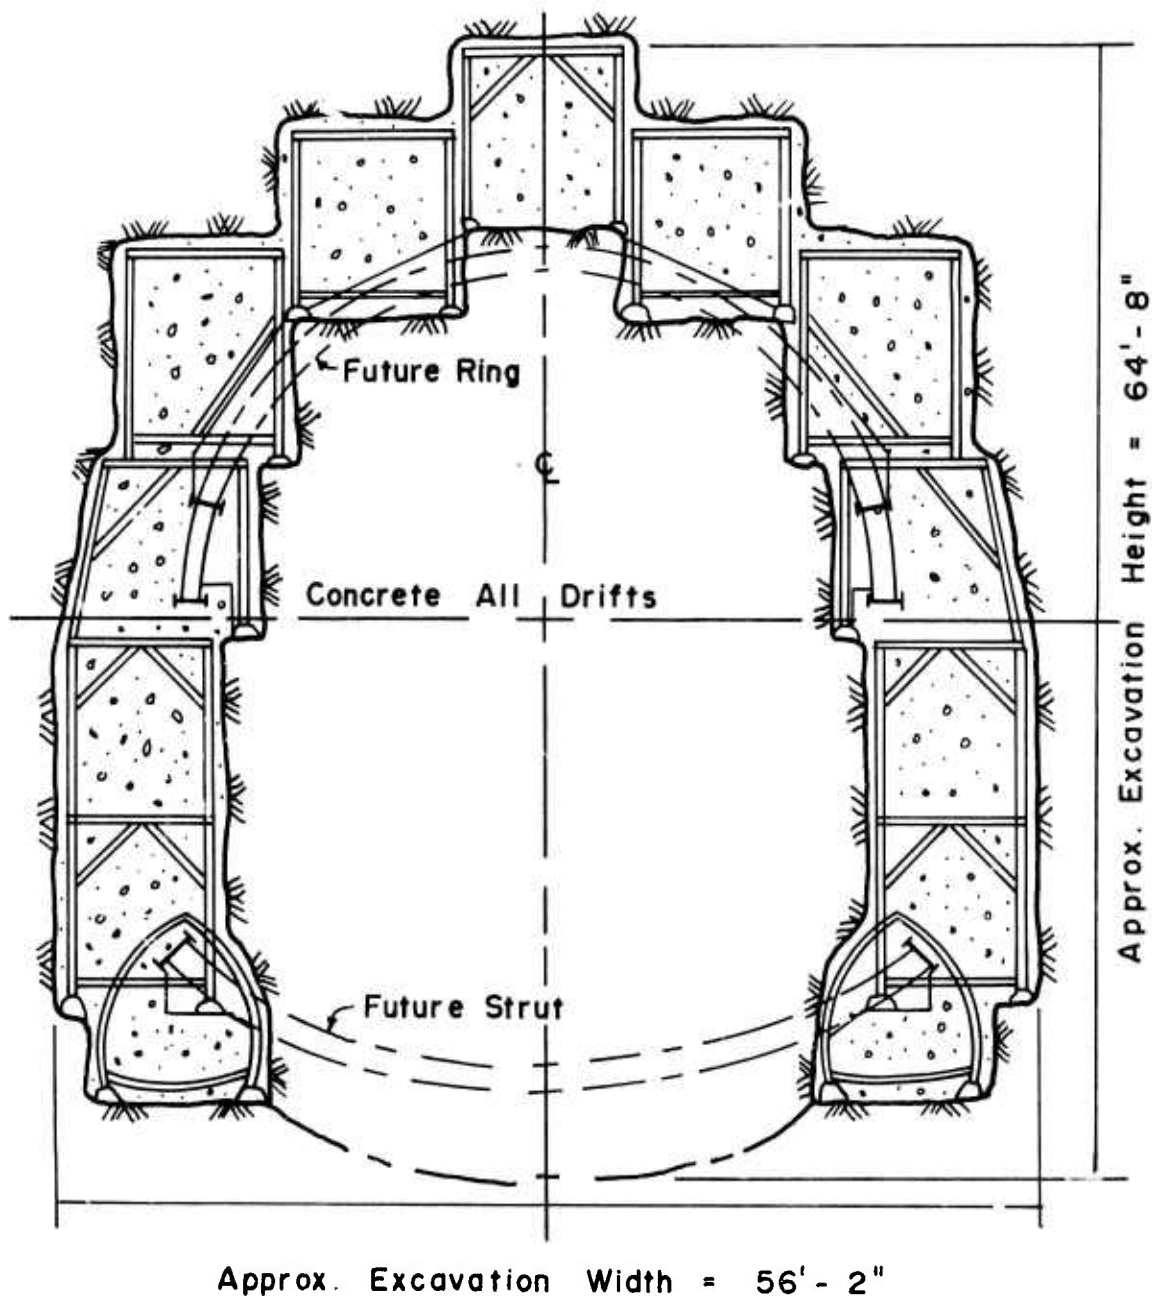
MULTIPLE DRIFT SYSTEM, STRAIGHT CREEK TUNNEL, ZONE II,
